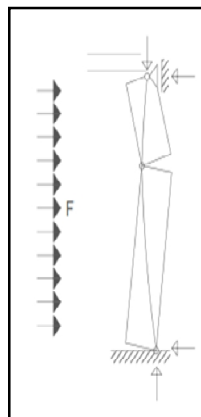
Instability failure under vertical action; section of the masonry wall [3]
